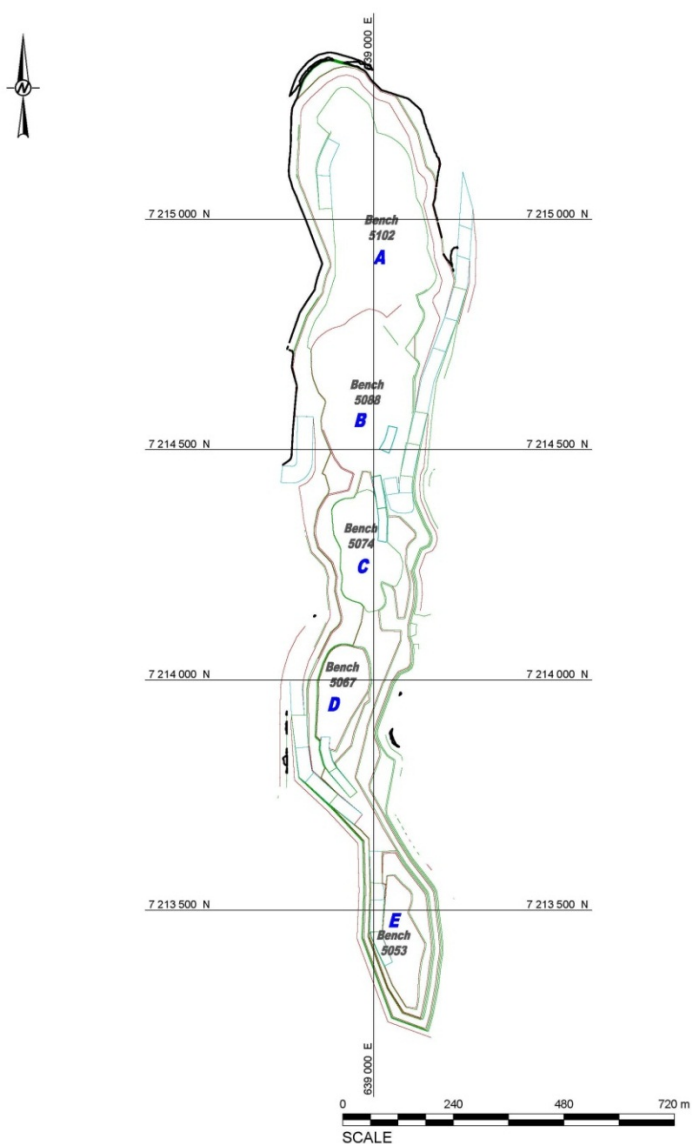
The Portage Pit at the time of the pit wall inspection site visit
